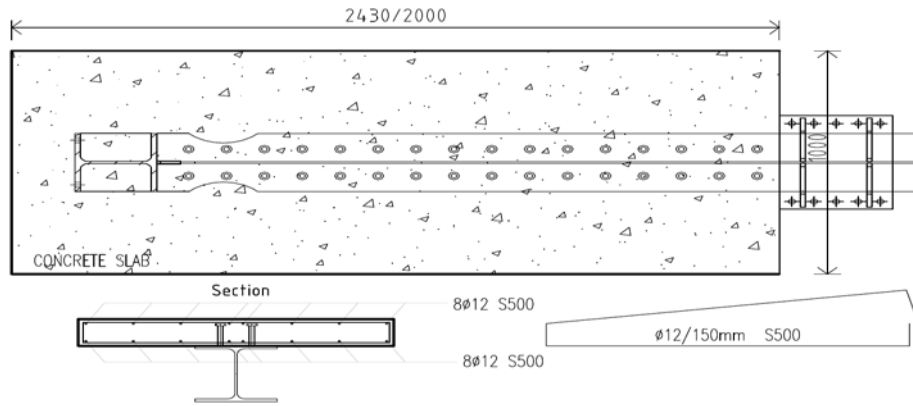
Detailing of reinforcing of concrete slab over beam-to-column joint
